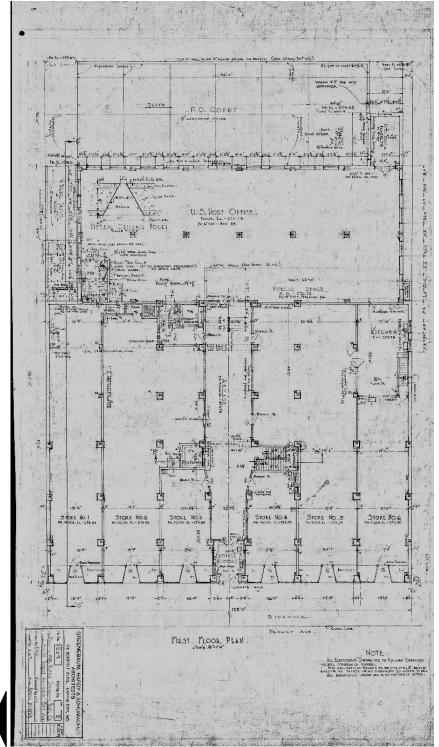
Historic Floor Plans, First Floor – Not to Scale Greenbaum, Hardy & Schumacher, Architects, 1929
